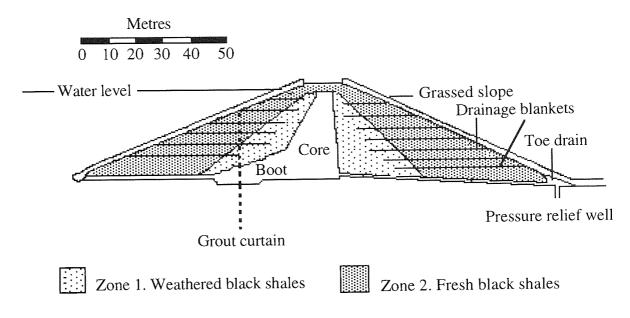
A section of the Carsington dam illustrating the differing zones of construction.
